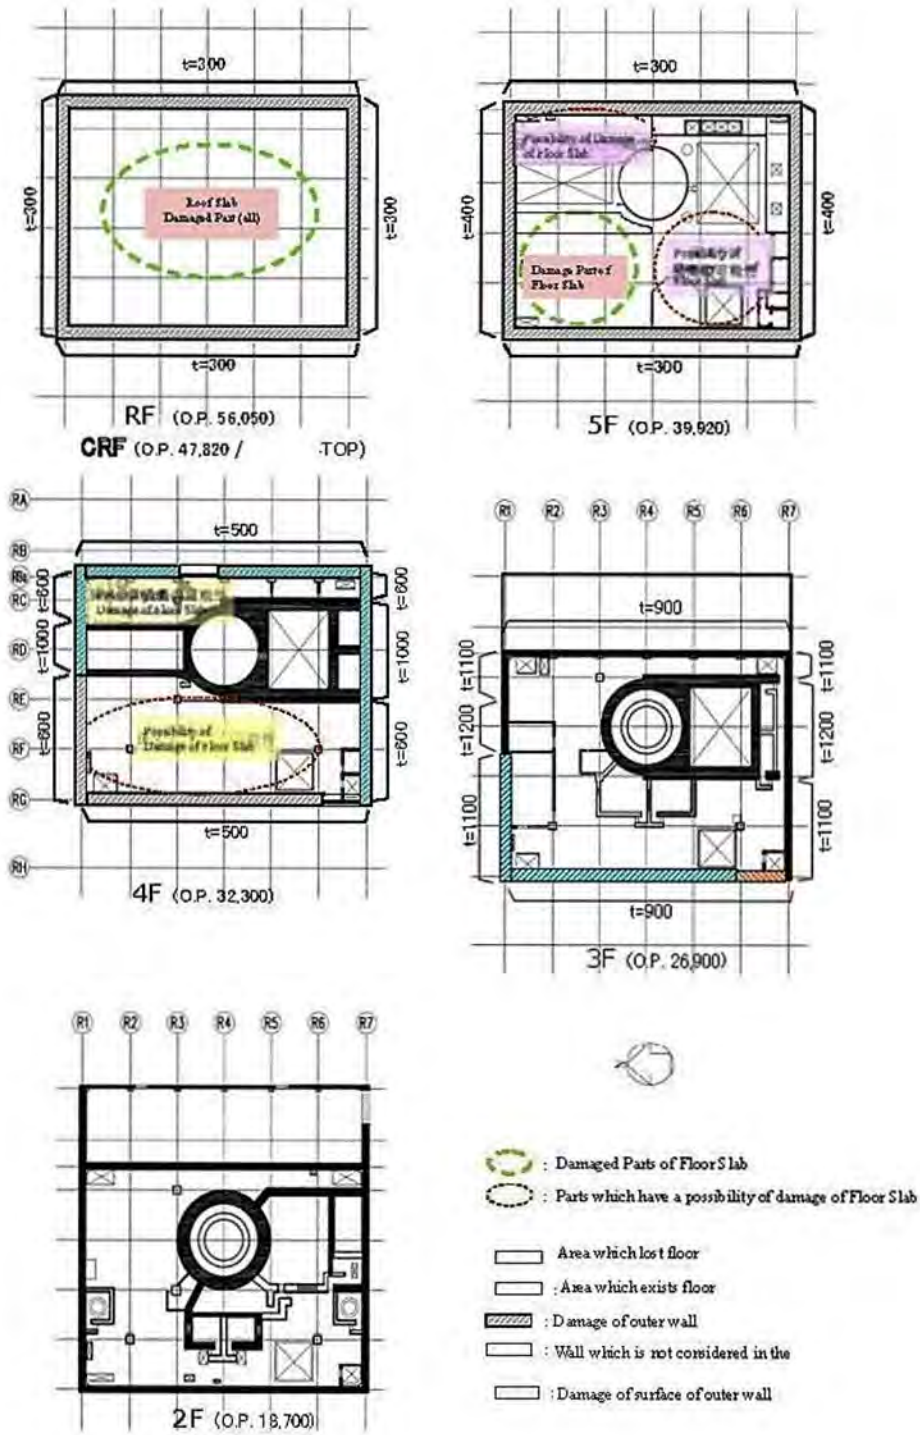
Damaged areas on 1F3 reactor building floor plan. (Courtesy of TEPCO Holdings [217])
